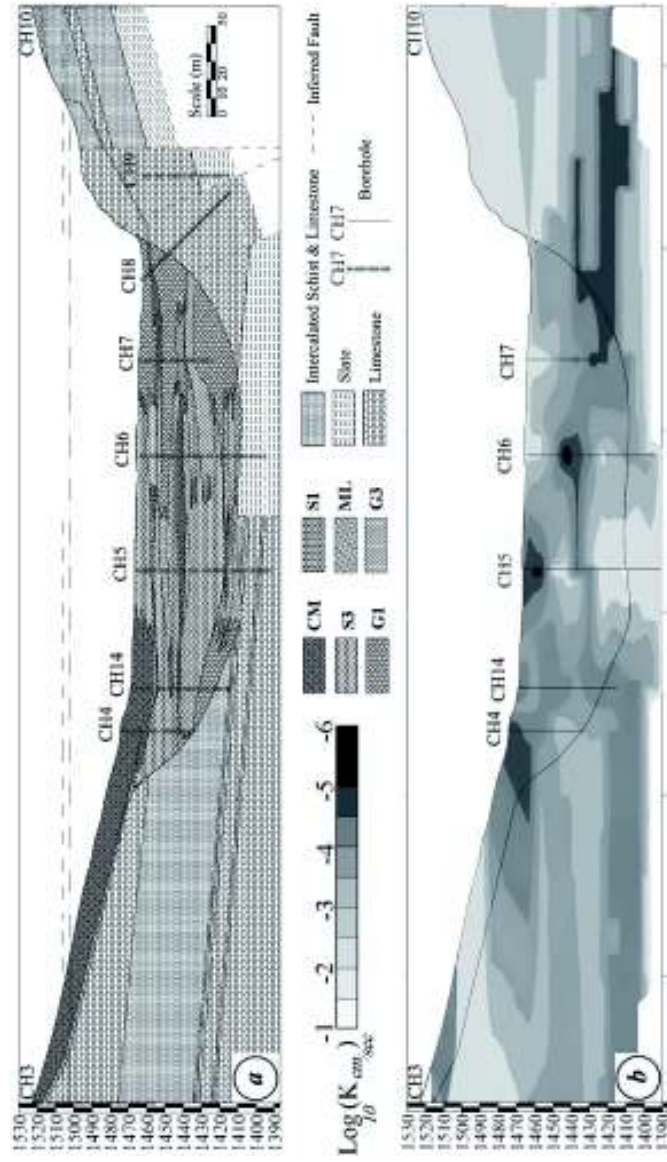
Soil and rock strata conditions (a) and permeability section (b) at dam foundation.
